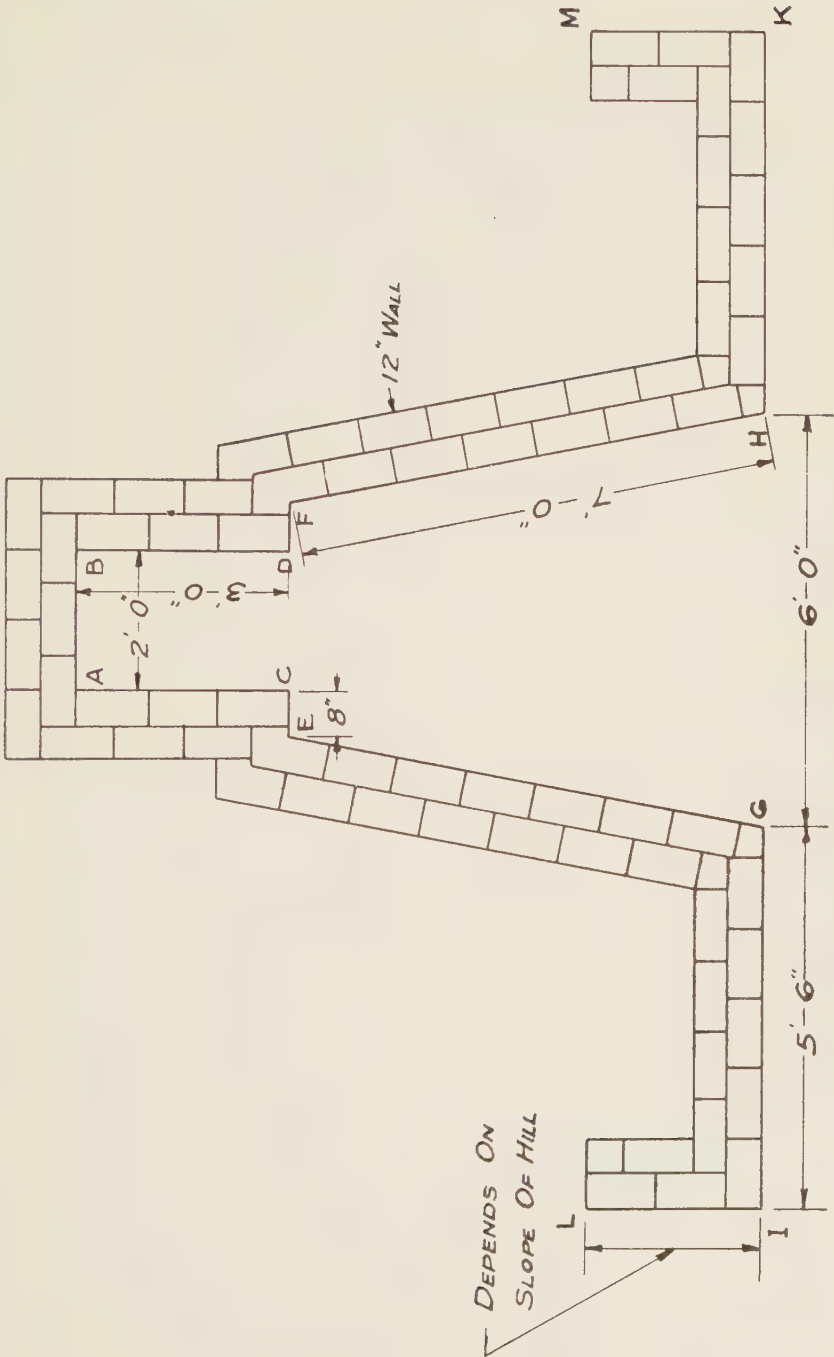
Foundation Wall of Kiln Constructed in and About Excavation Shown in Figure 13.
